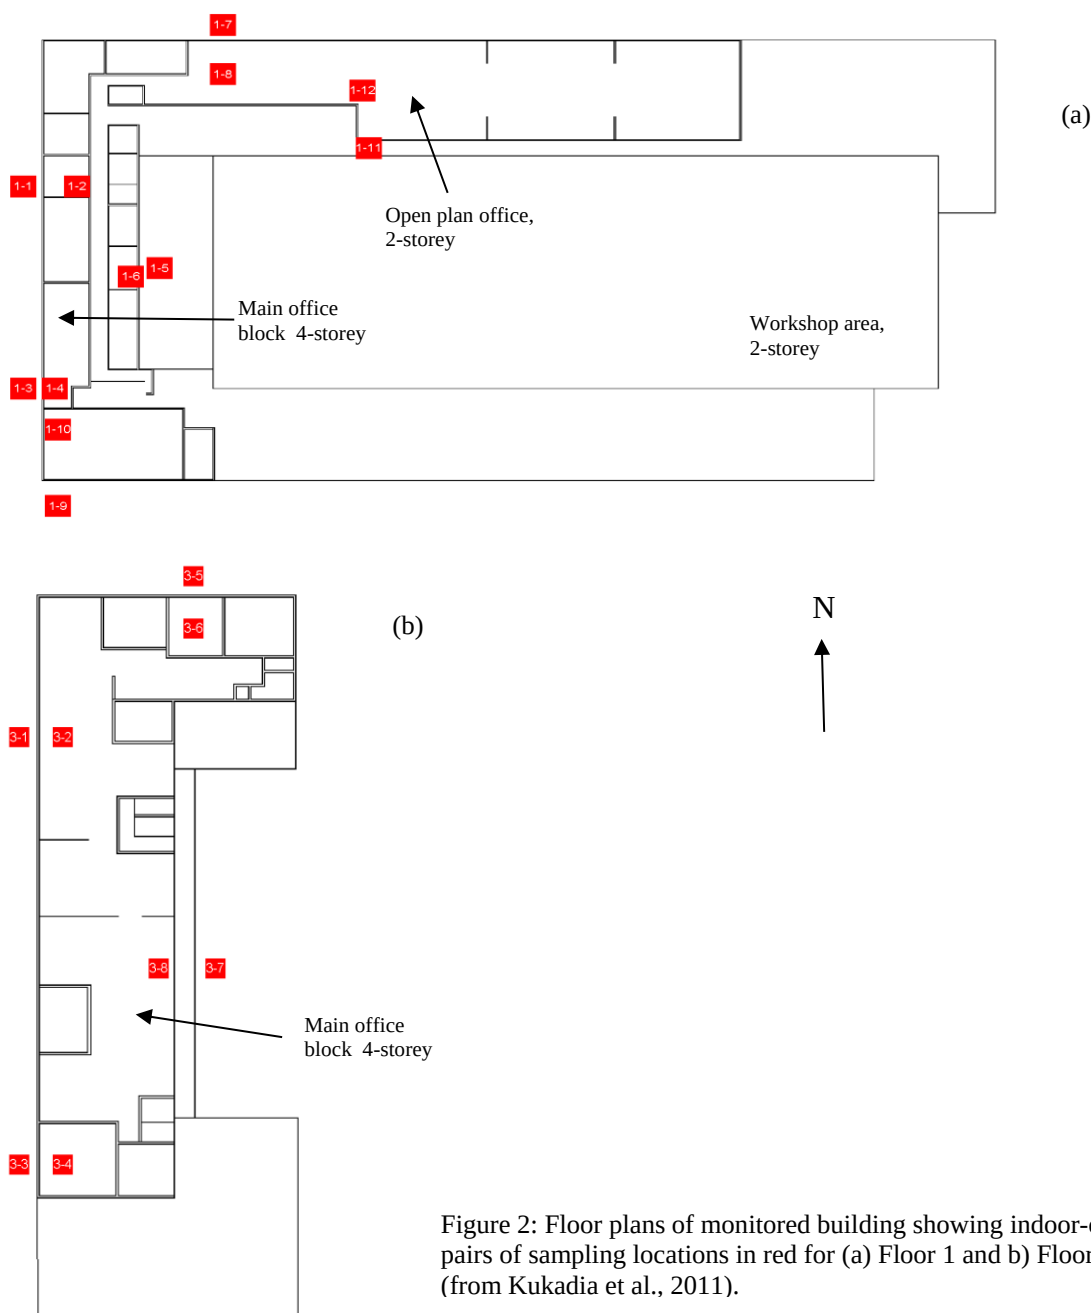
Floor plans of monitored building showing indoor-outdoor pairs of sampling locations in red for (a) Floor 1 and b) Floor 3 (from Kukadia et al., 2011).
